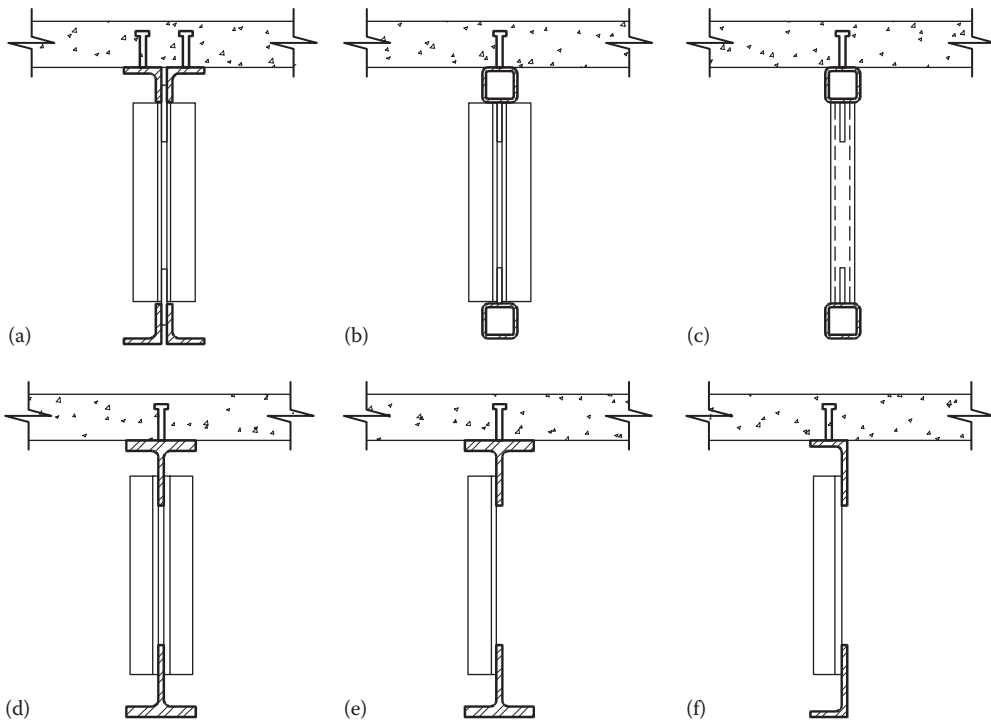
Composite truss schematic sections: (a–c) top and bottom chords with gusset plates; (d–f) top and bottom chords without gusset plates.
